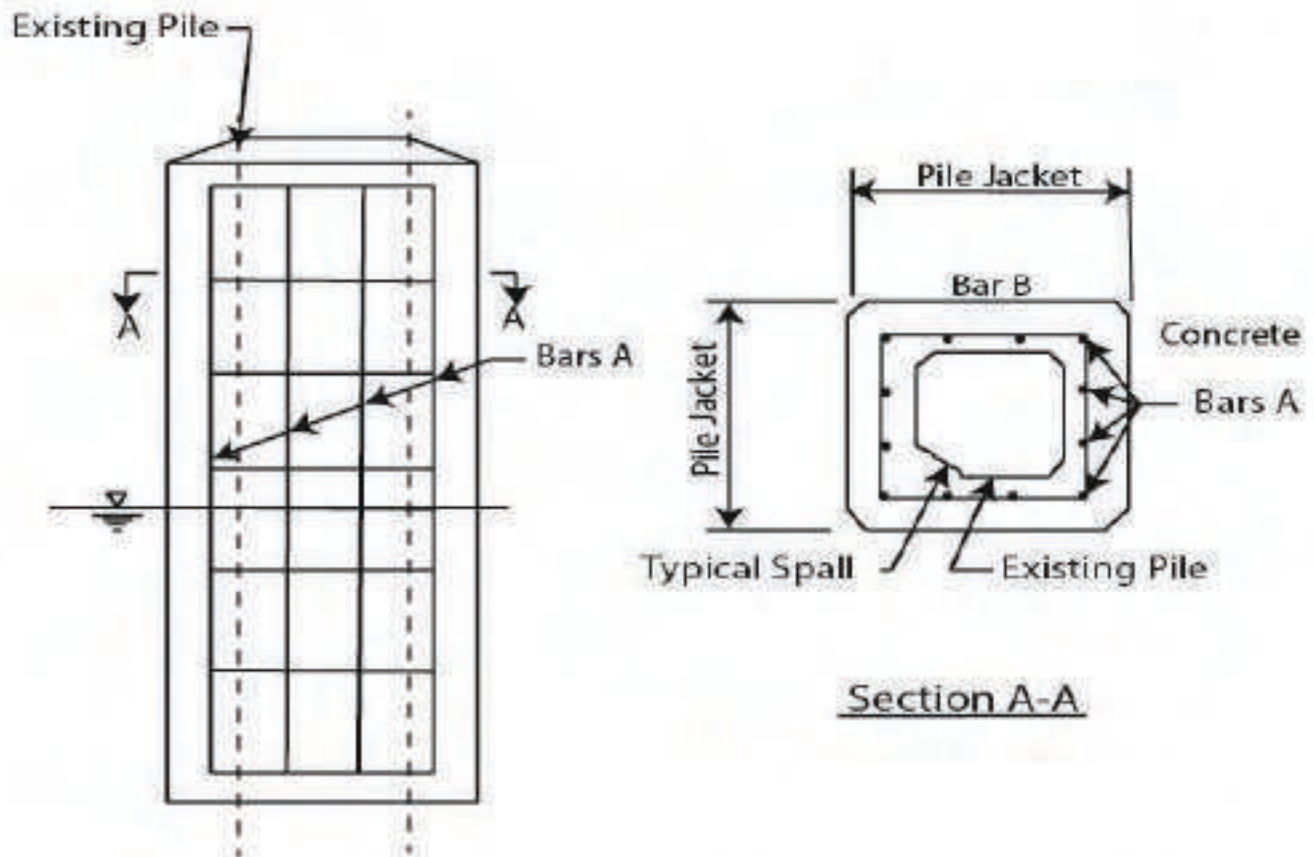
Concrete Pile Jacket with Steel Reinforcing Cage
